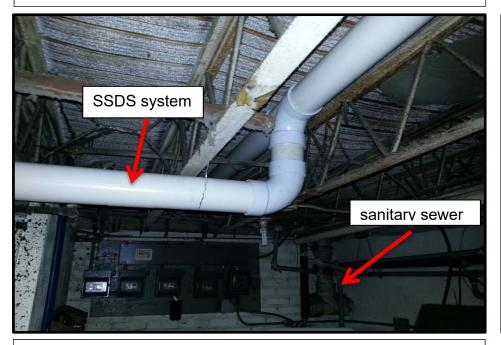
This photograph looks west-southwest within the Block basement, and prominently shows a portion of the SSDS that remains operating at the site. Shown in the background is the sanitary sewer connection that accepted water from the former floor drain in photos 2 and 3.
